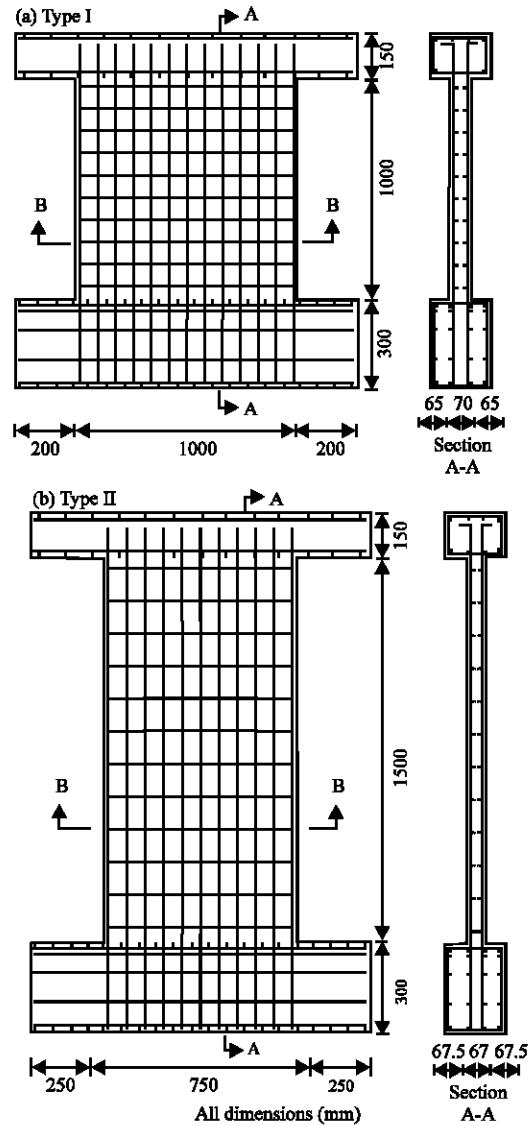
Geometries and reinforcement details of Vecchio and Palermo flanged shear walls
